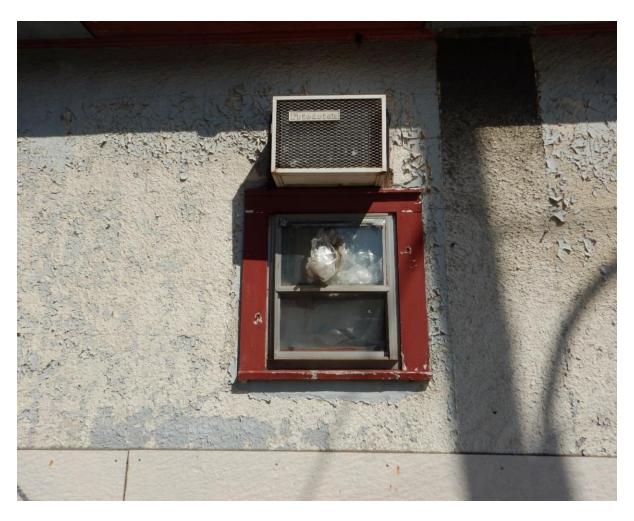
SOUTH ELEVATION WINDOW DETAIL
